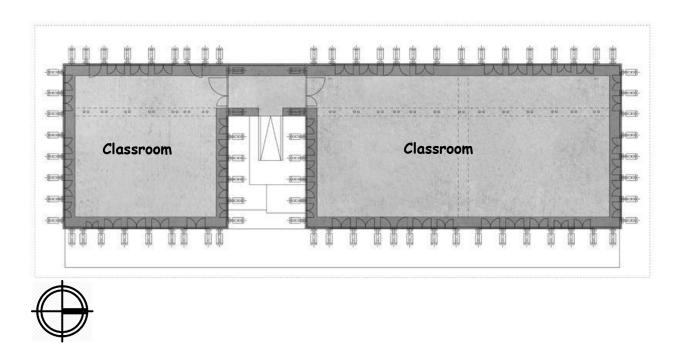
Upper Floor Plan of METI School (MoMA, n.d.)
